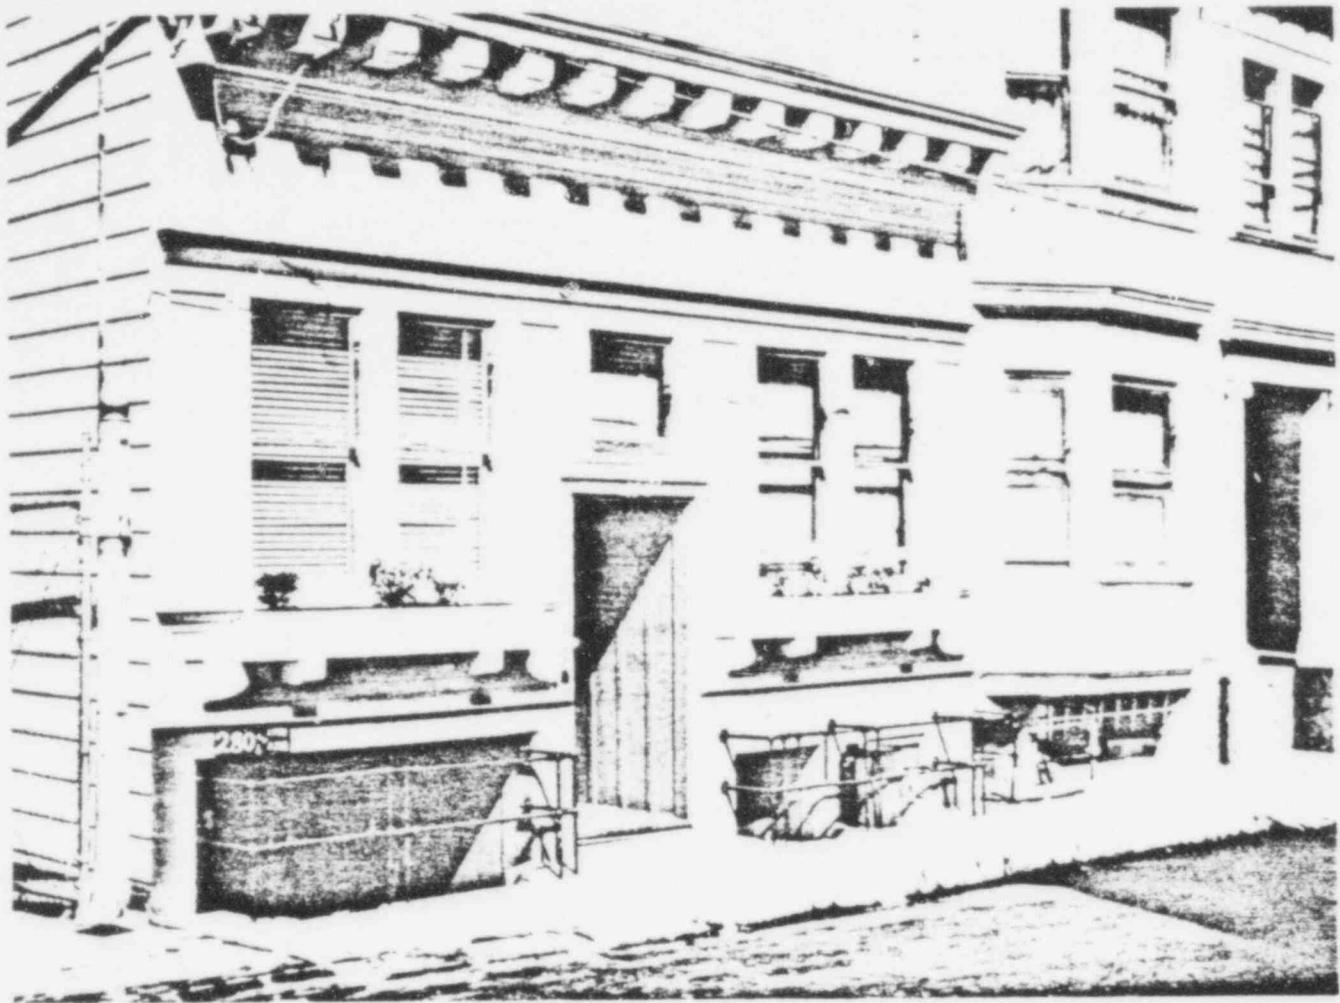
Subsidence of San Francisco buildings built on filled ground that was formerly swamp. Street and sidewalk have been raised by additional fill; the top of the garage door on the left side of the house is now only about 2 feet (0.6m) above the sidewalk (California Division of Mines and Geology, 1966, p. 452).
